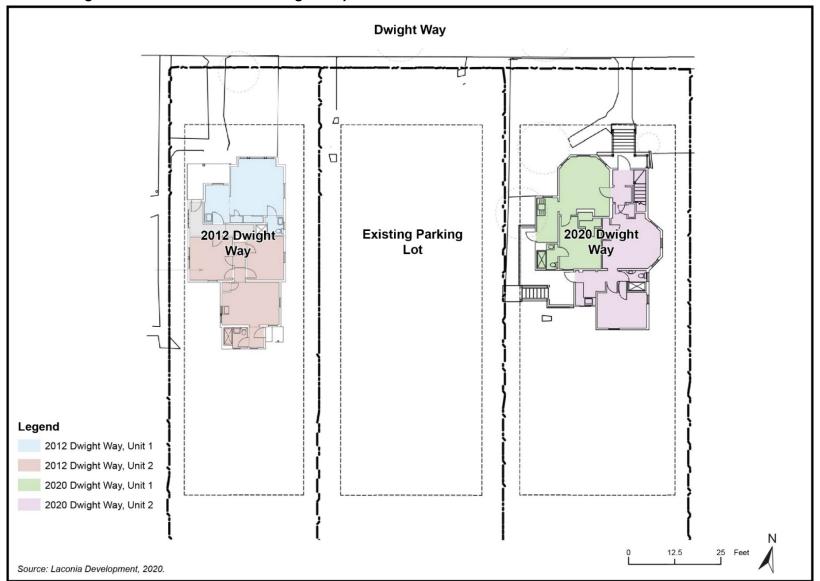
Existing Site Plan – 2012 and 2020 Dwight Way
